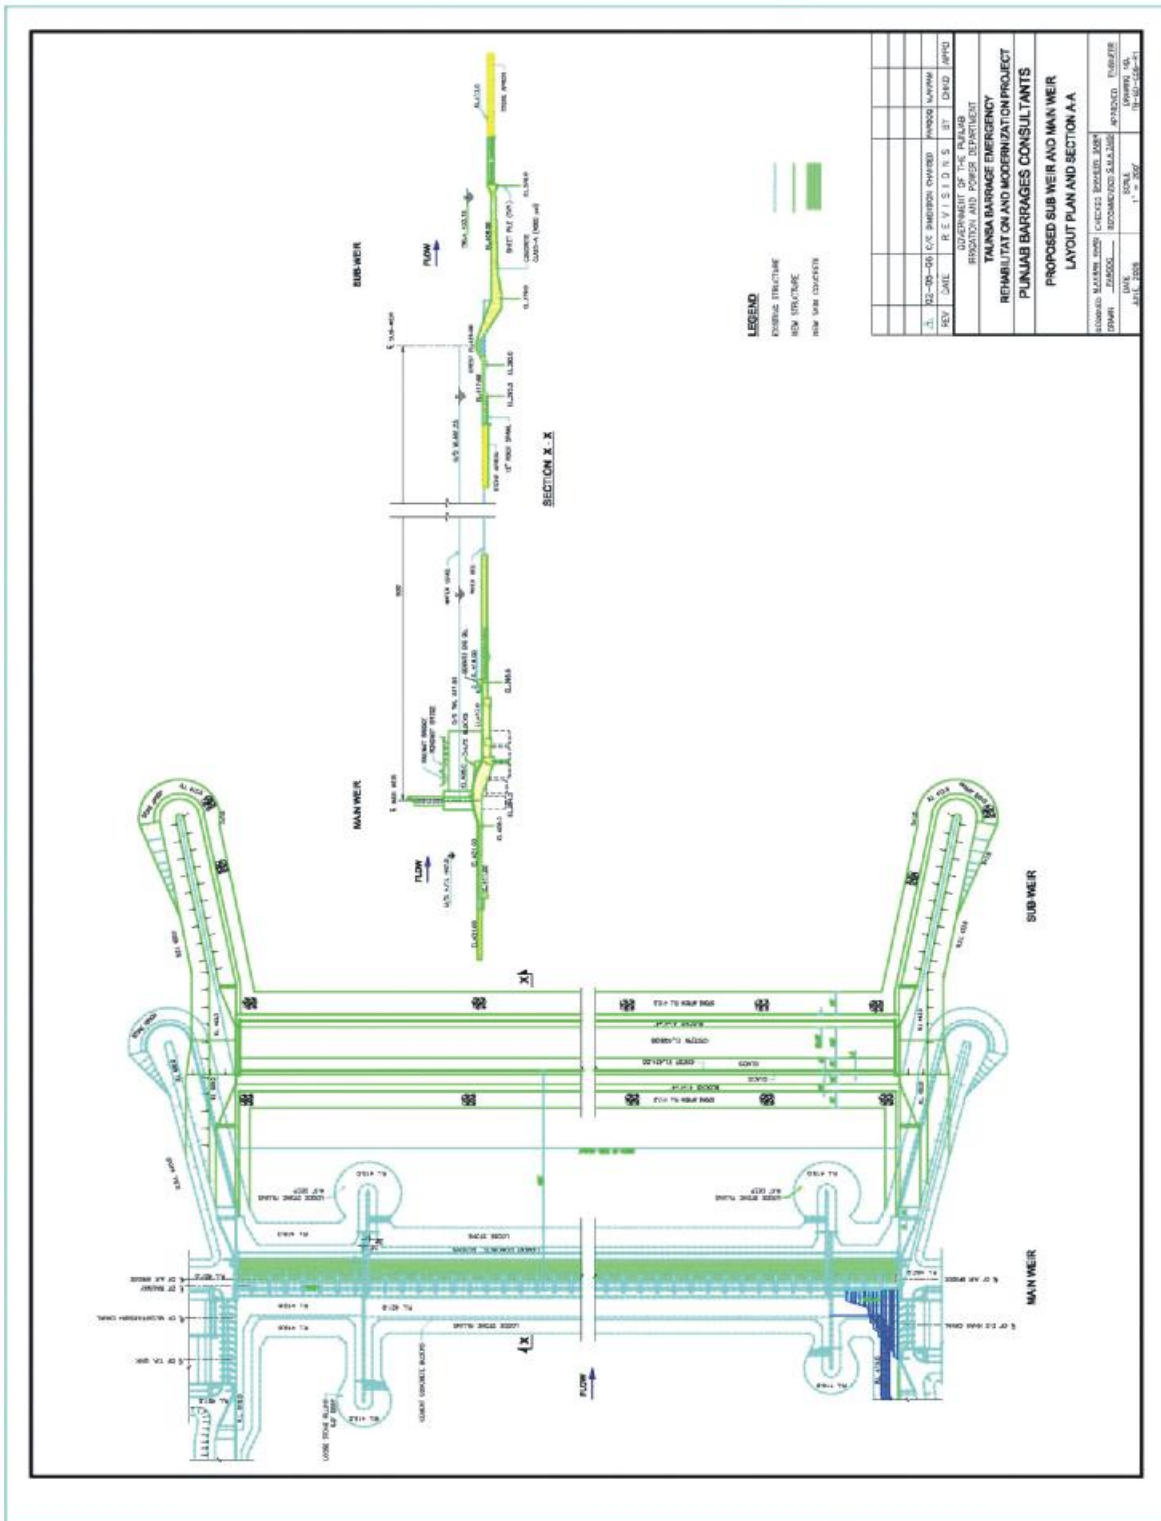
Main Existing Barrage and Sub-Weir - Plan and Cross Section
